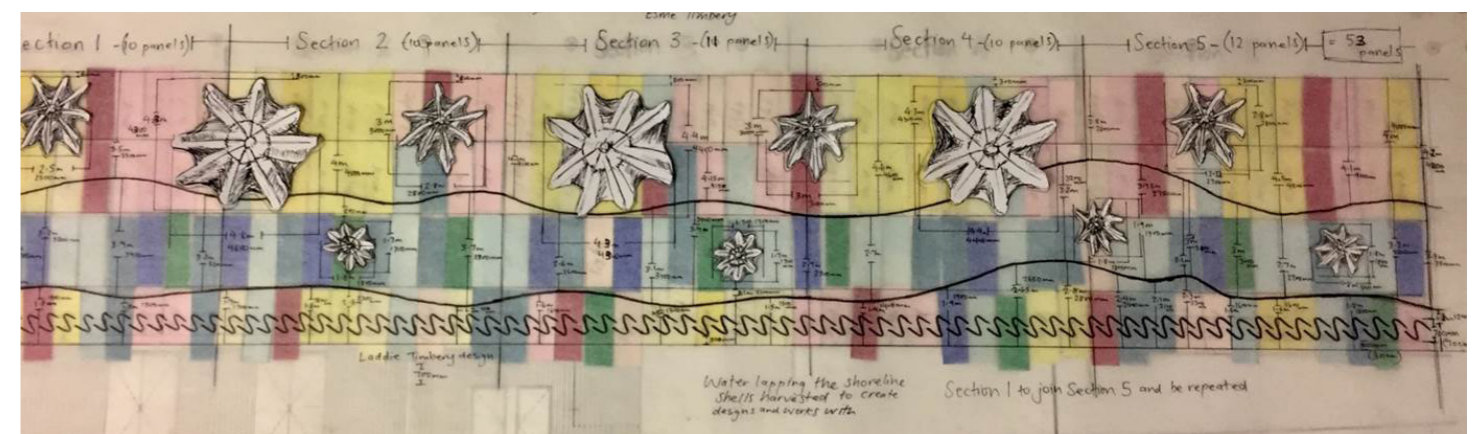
Original artists' sketch with colour overlay over Campbell Road ventilation facility northern elevation
